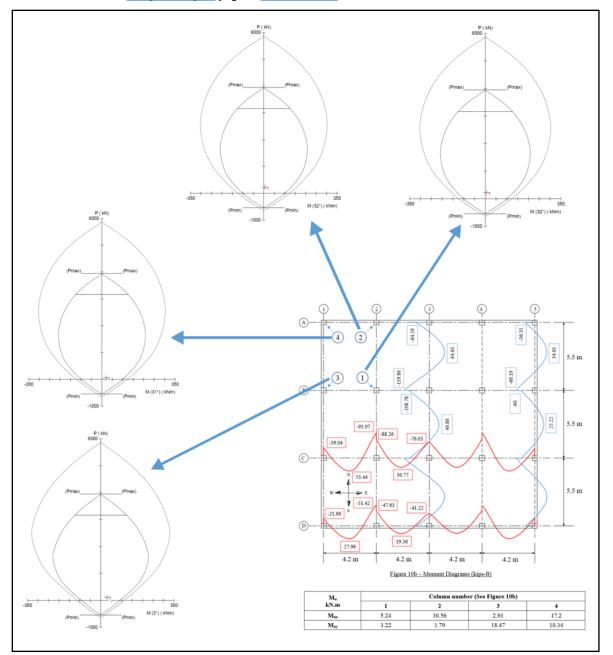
Sample Calculations of Column Design from "Two-Way Flat Plate Concrete Slab Floor Analysis and Design" Design Example
